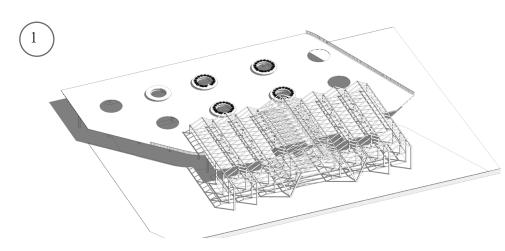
Glue-laminated columns and beams structure (Masu 2023) The primary structure of the building is made up of glue-laminated timber columns and beams and underneath by the public transport facility is concrete columns and a waffle slab. Timber being more sustainable and environmentally friendly as compared to steel.
